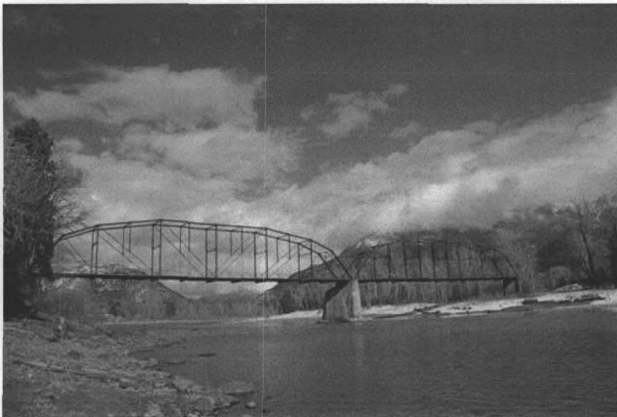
West elevation of the Flathead River Bridge. View to the east.
